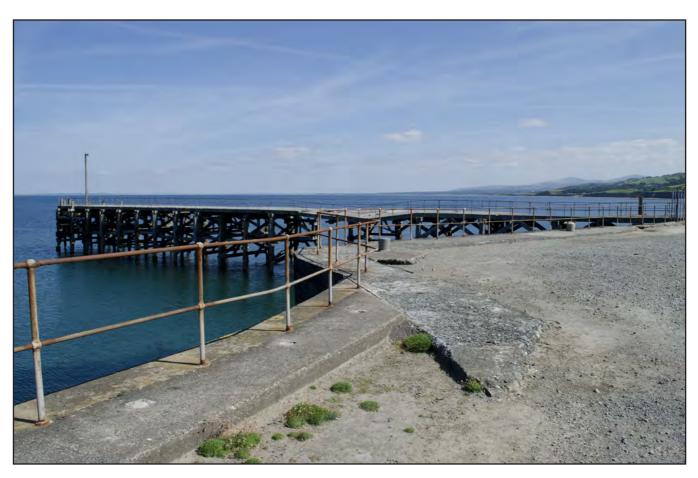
General view from the southwest of the wooden pier looking from the stone pier section (archive image: G2475_Trefor_Pier_004)
